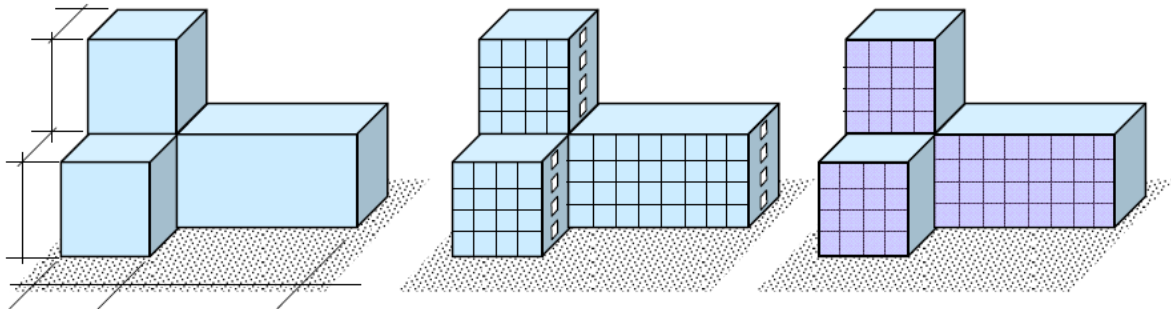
Components of seismic structural configuration: (a) overall geometry, (b) structural elements (e.g., moment resisting frames and structural walls), and (c) significant non-structural elements (e.g., façade glass)
